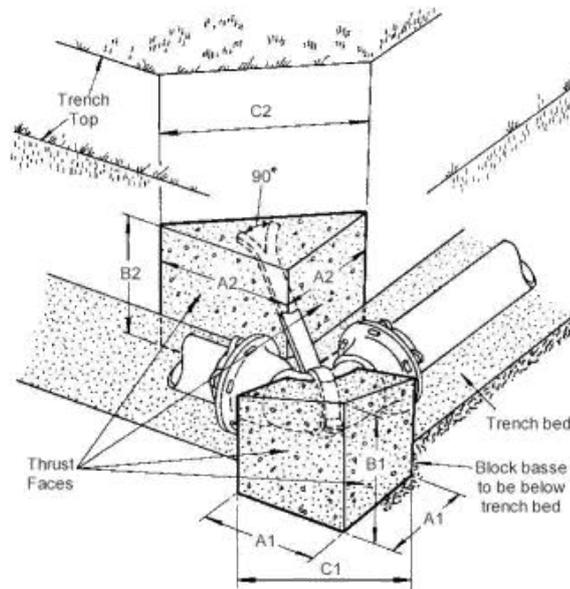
Anchor Block Sizes for Typical Two-Block Arrangements
